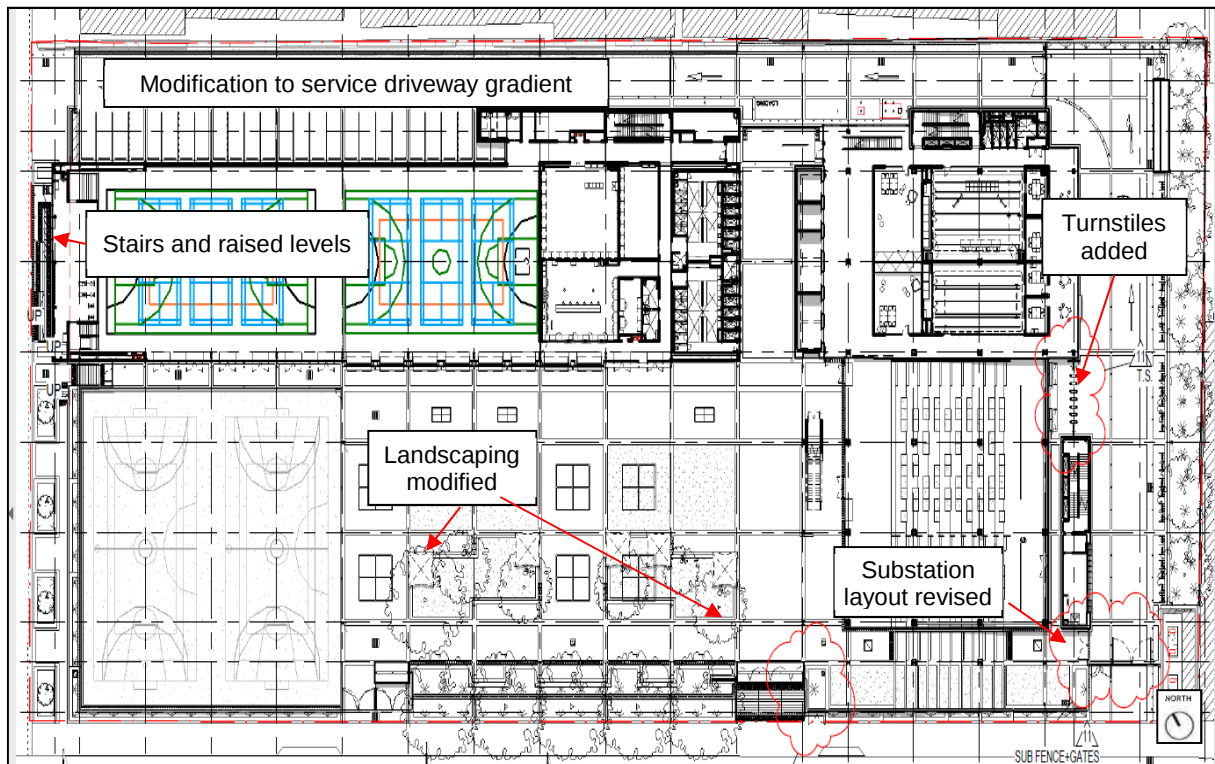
Proposed APHS Ground Floor Plan (Source: Applicant's Modification 3 EIS)
